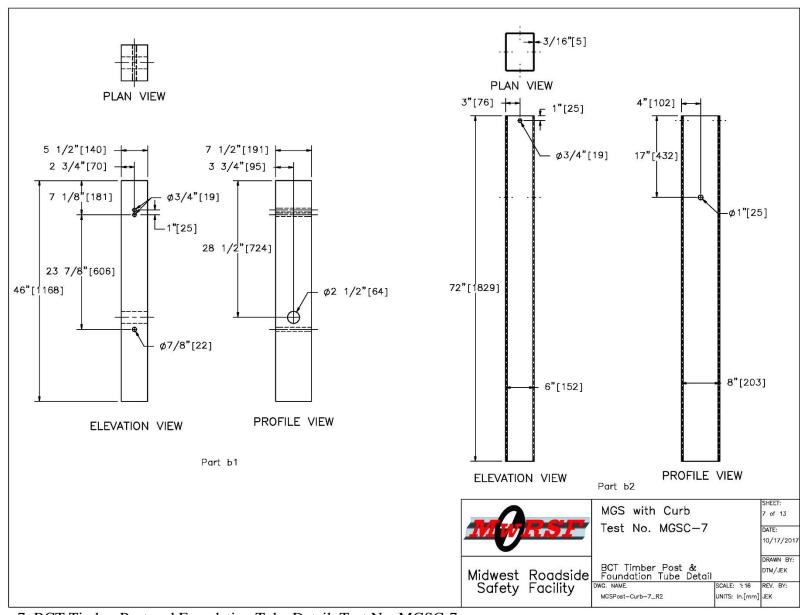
BCT Timber Post and Foundation Tube Detail, Test No. MGSC-7
